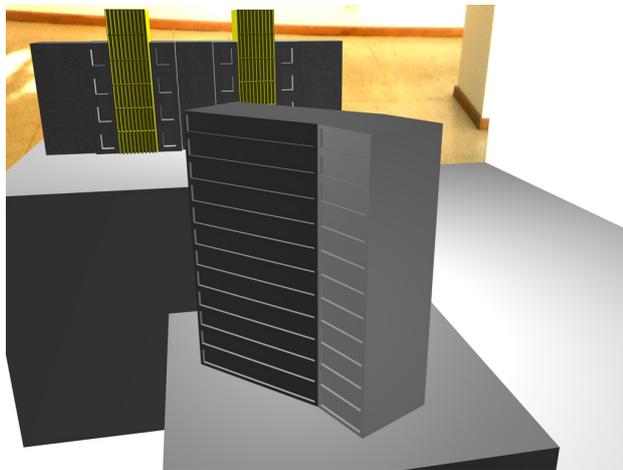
3D sketch of tower block and hotel buildings in Panevezys, 2007.
